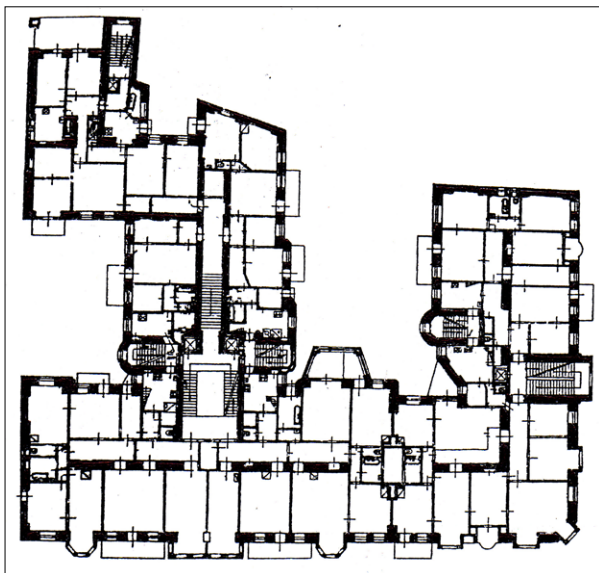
Tenement house at 1 Yaroslaviv Val Street in Kyiv, repetitive floor plan; from the collection of Y. Ivashko
